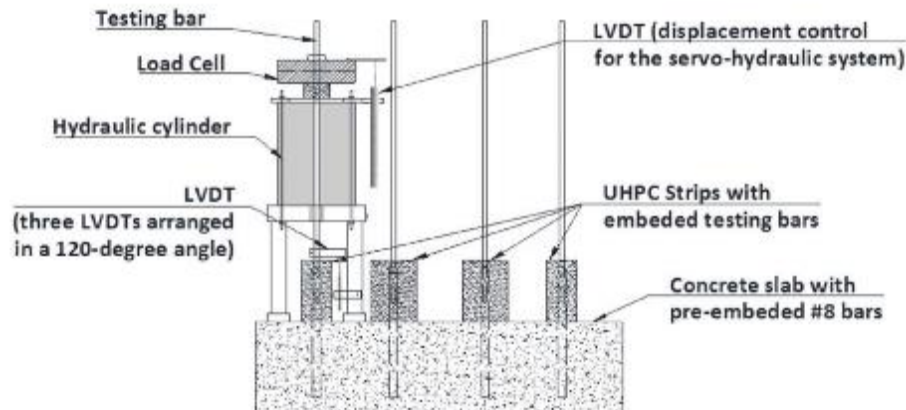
FHWA reinforcing bar bond test loading setup (Yuan and Graybeal 2014)
